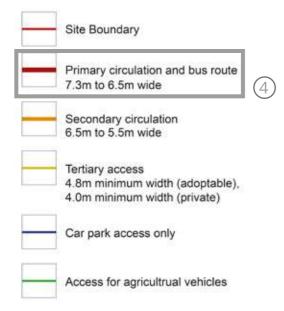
Extract from Alternative Road Hierarchy Parameter Plan 5055-ES-04 F
